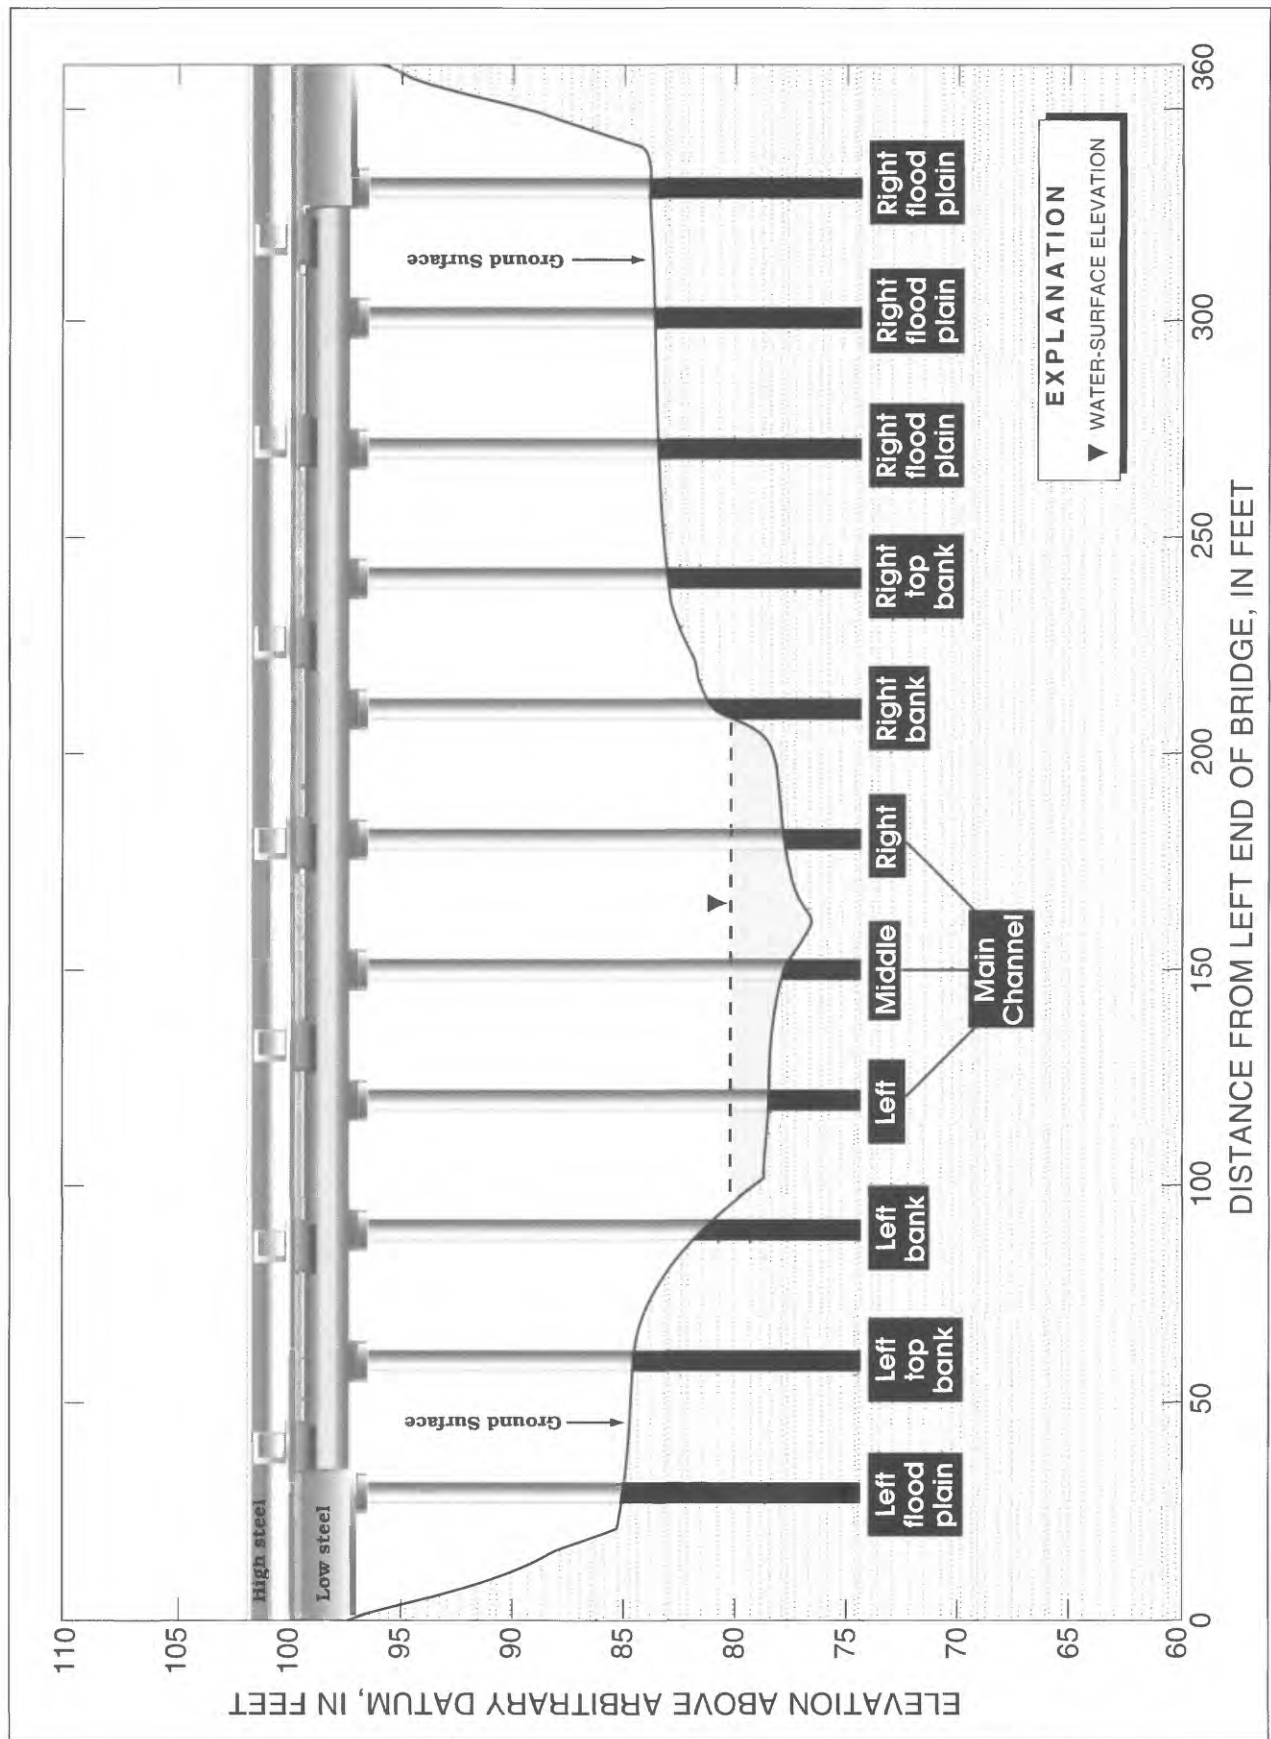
The pier and (or) pile-bent location plan (looking downstream).
